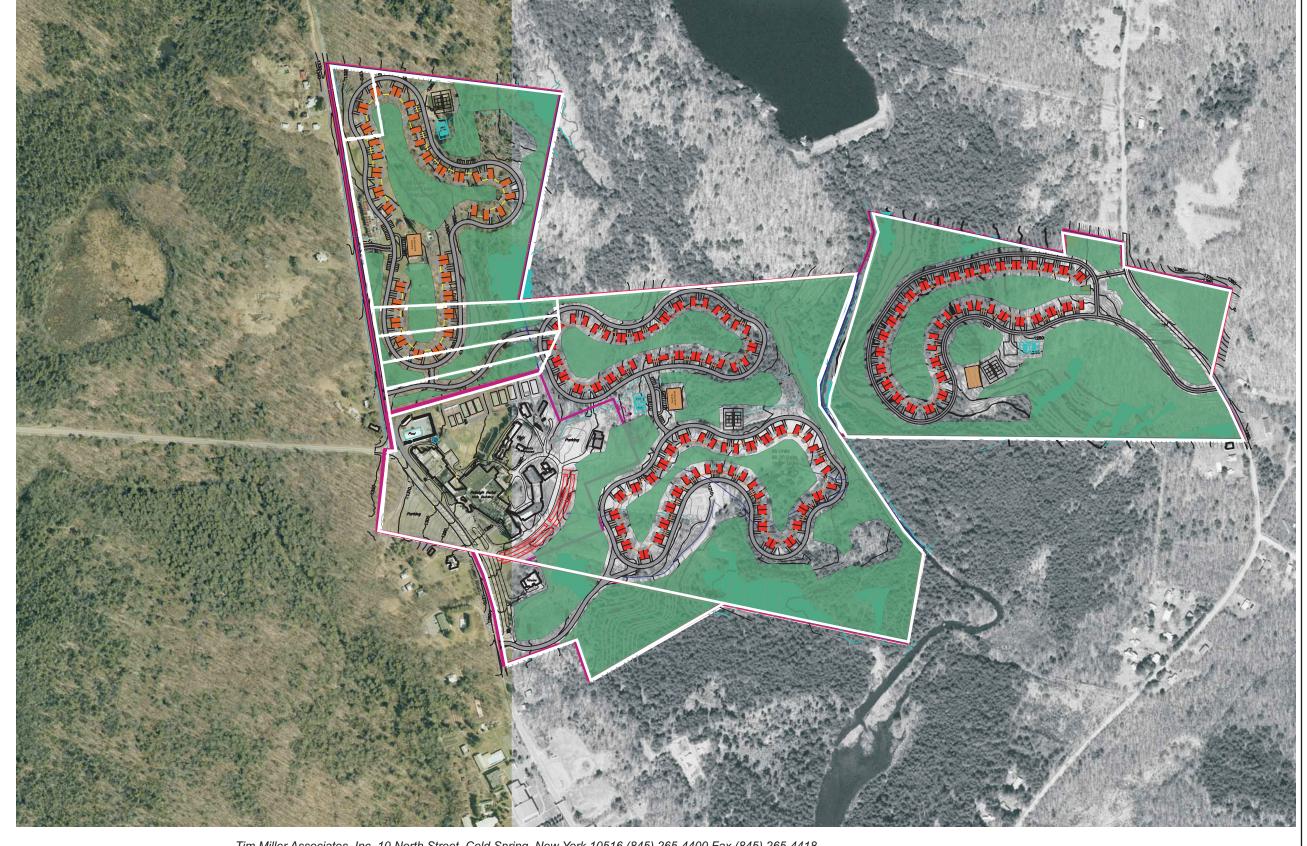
Site Plan Overlay on Aerial Photo Raleigh and Heiden Properties Town of Fallsburg, Sullivan County, New York Source: New York State DEC Imagery Date: August 18, 2008 Scale: 1" = 400'
